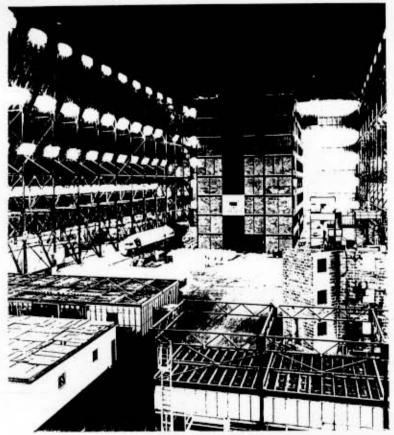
Eight storey steel framed structure in the Large Building Test Facility
